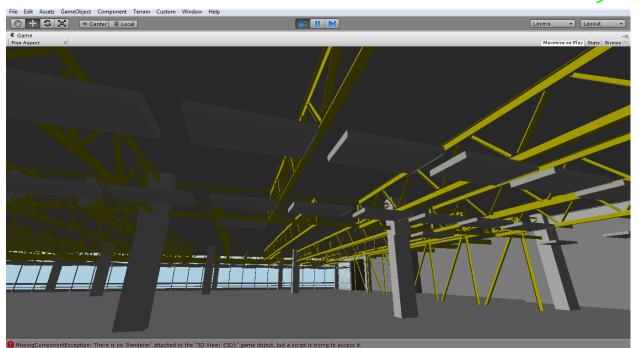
Screenshot of bare floorplan with ceilings and mechanical system toggled off
